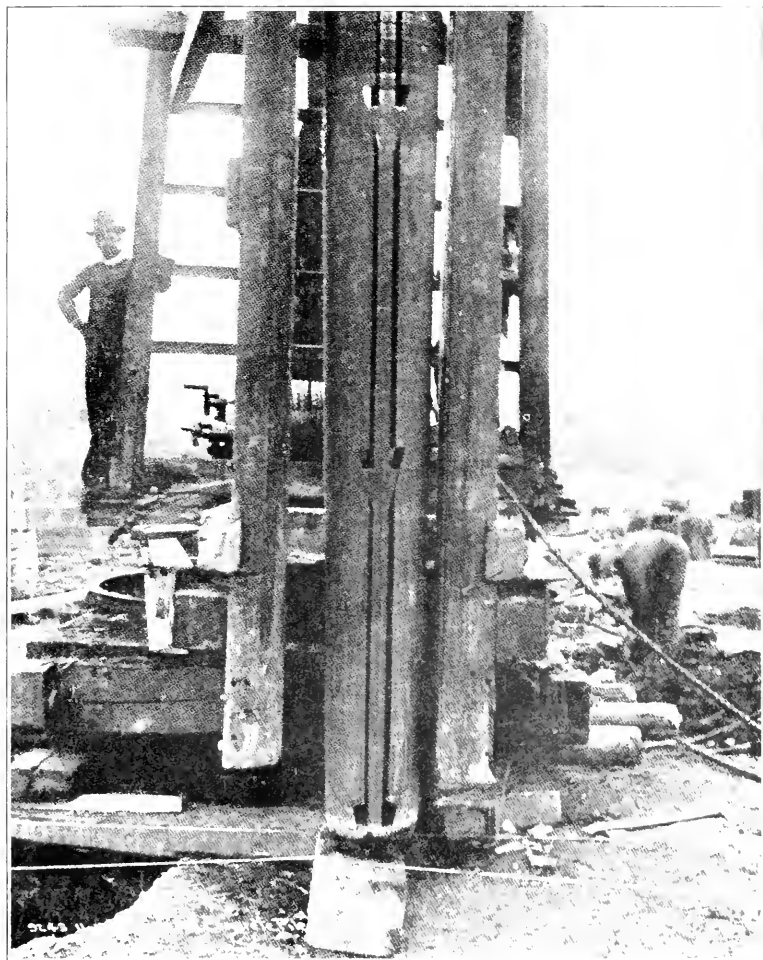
Raymond Pile Core. This core is used to drive to rock and tapers from 20 to 13 inches. The cut shows core full size as it is driven.
